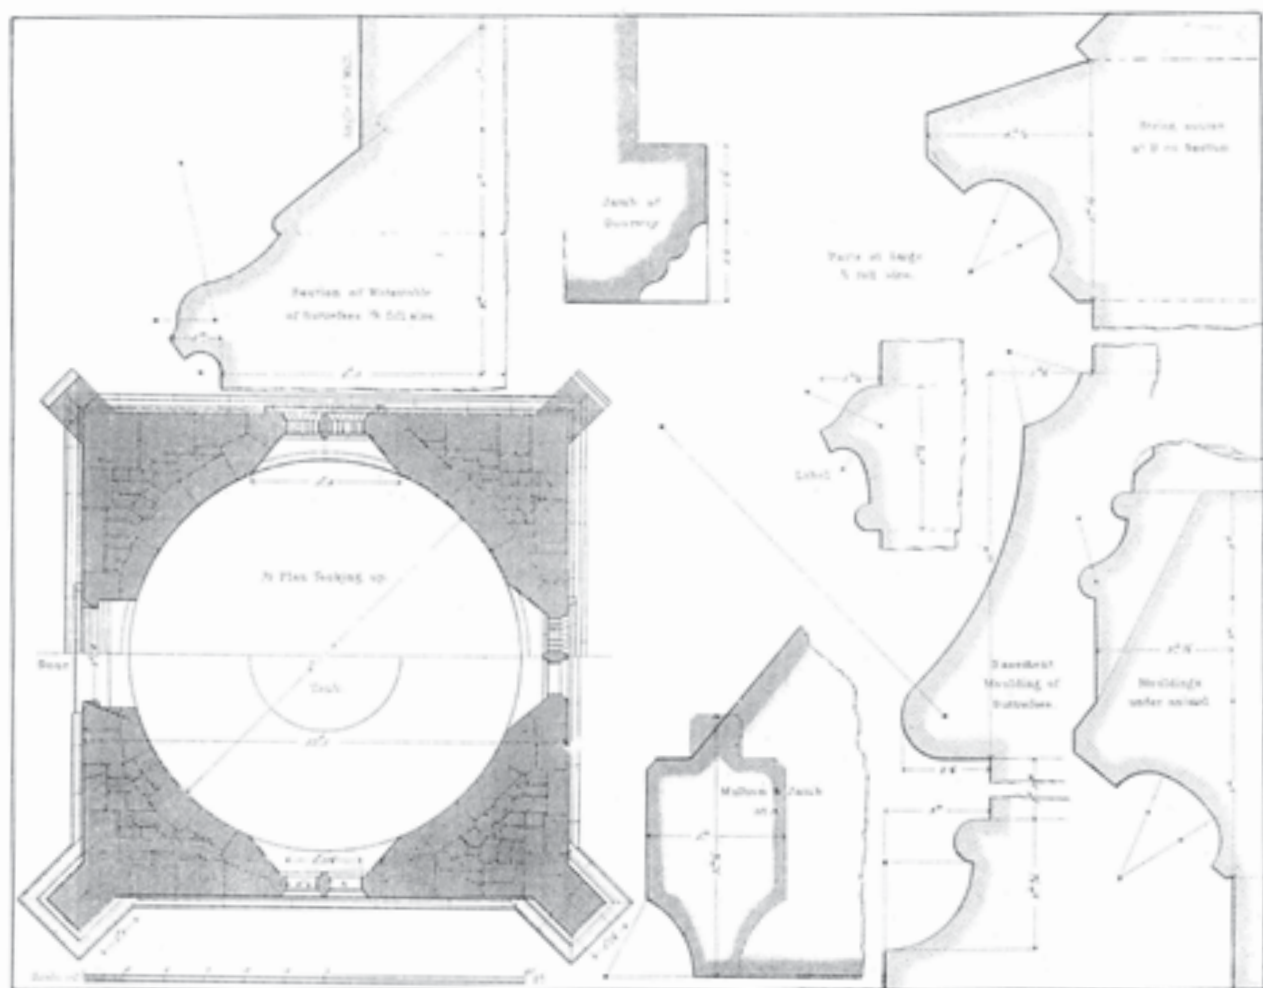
Details of the well-house in the 1830s: plan and moulding profiles. After Pugin and Pugin 1895
